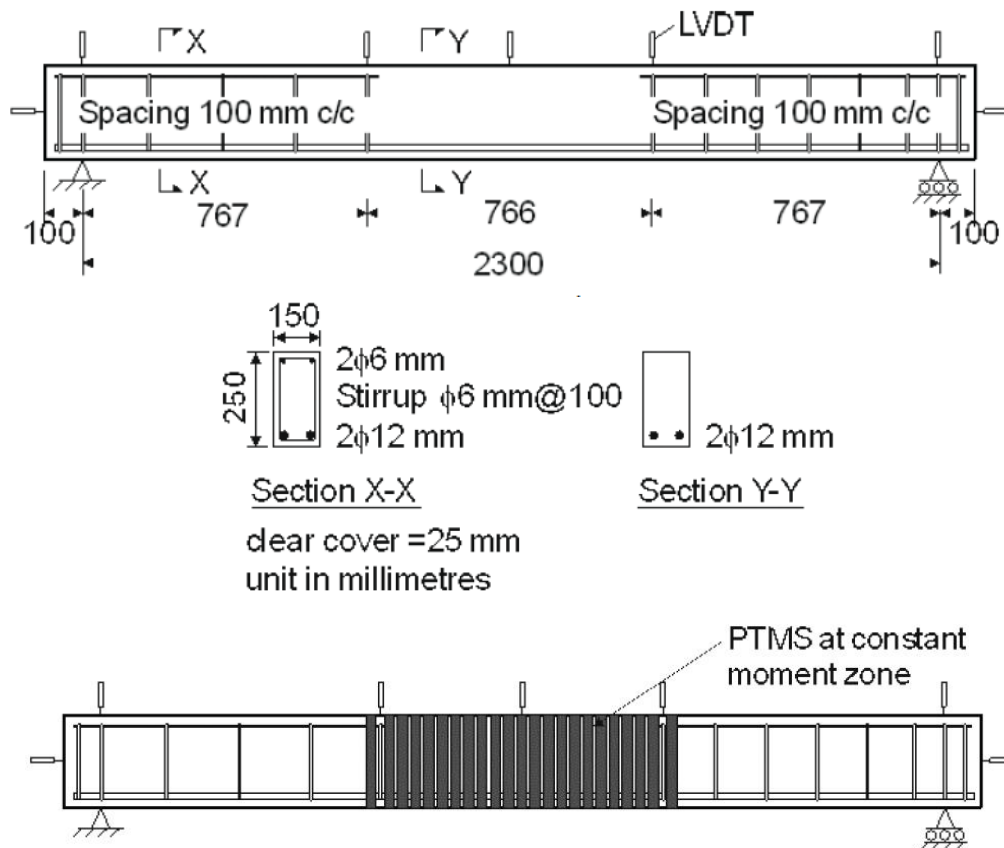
Beam details of the specimen used by Sektik et al. [22]
